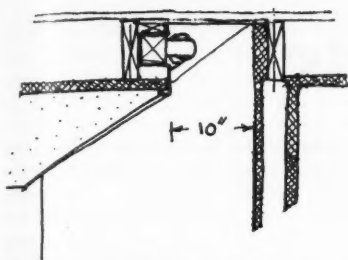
, the use of fluorescent lamps to flood a wall with light—with traditional floor construction.
